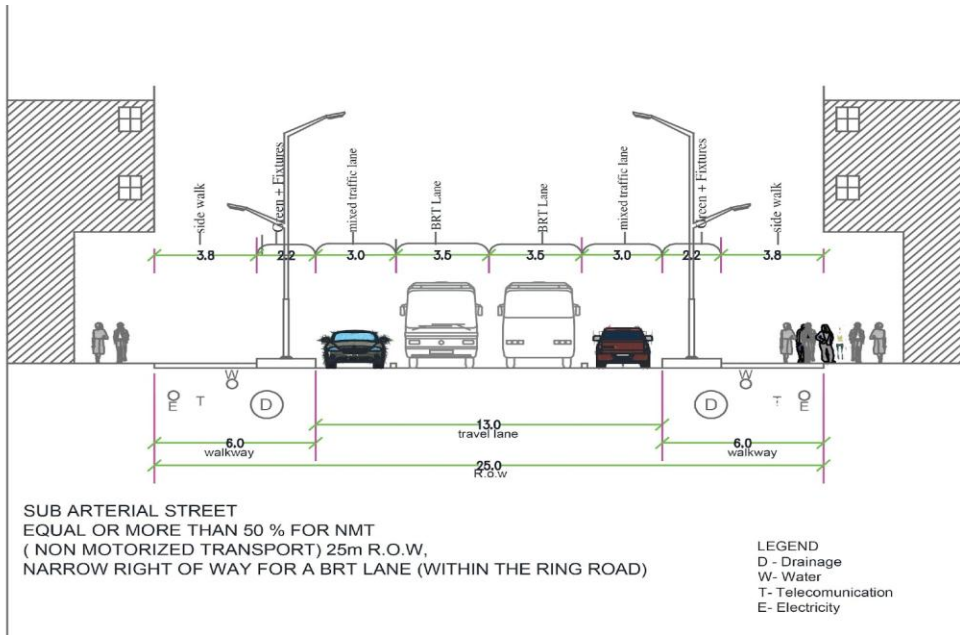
Street section (a) of Sub-Arterial Road inside the inner ring road
